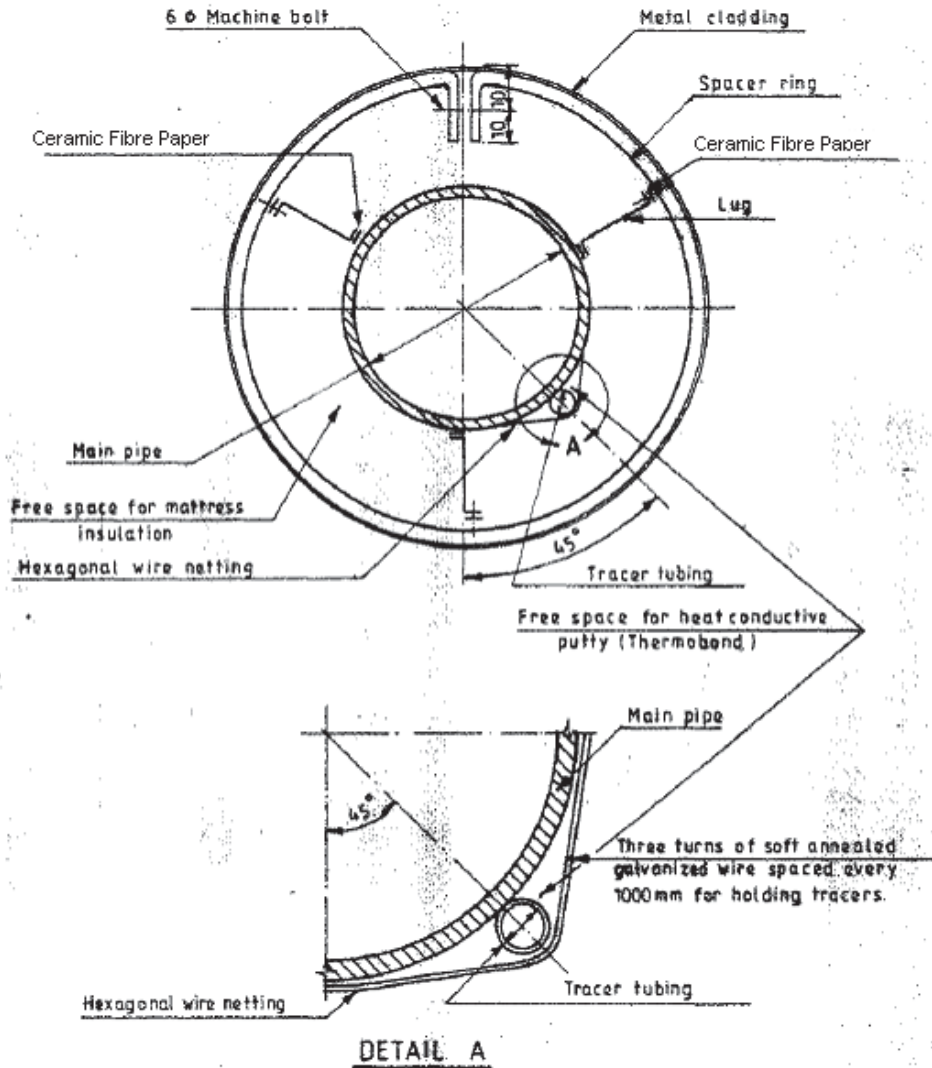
DETAILS OF INSULATION ON STEAM TRACING
